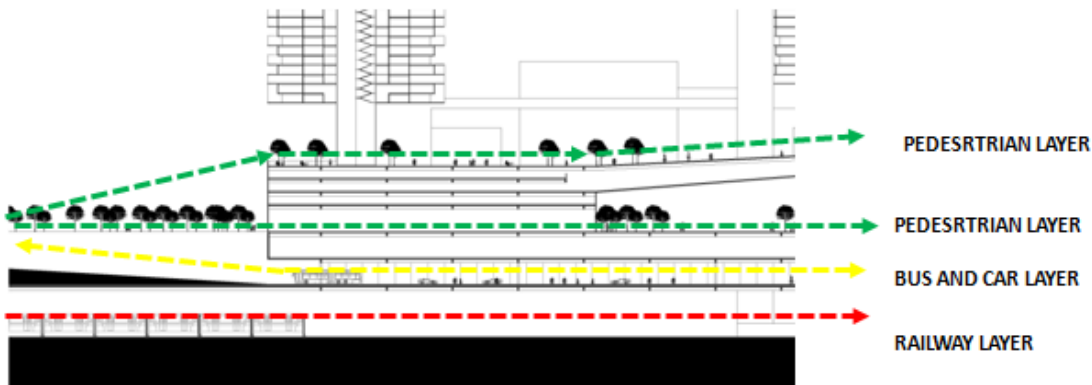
Connection with urban transportation system. The underground floor is for the railway.
